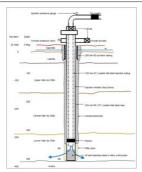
Typical section of the brine injection wells planned for the Autazes Potash Project
